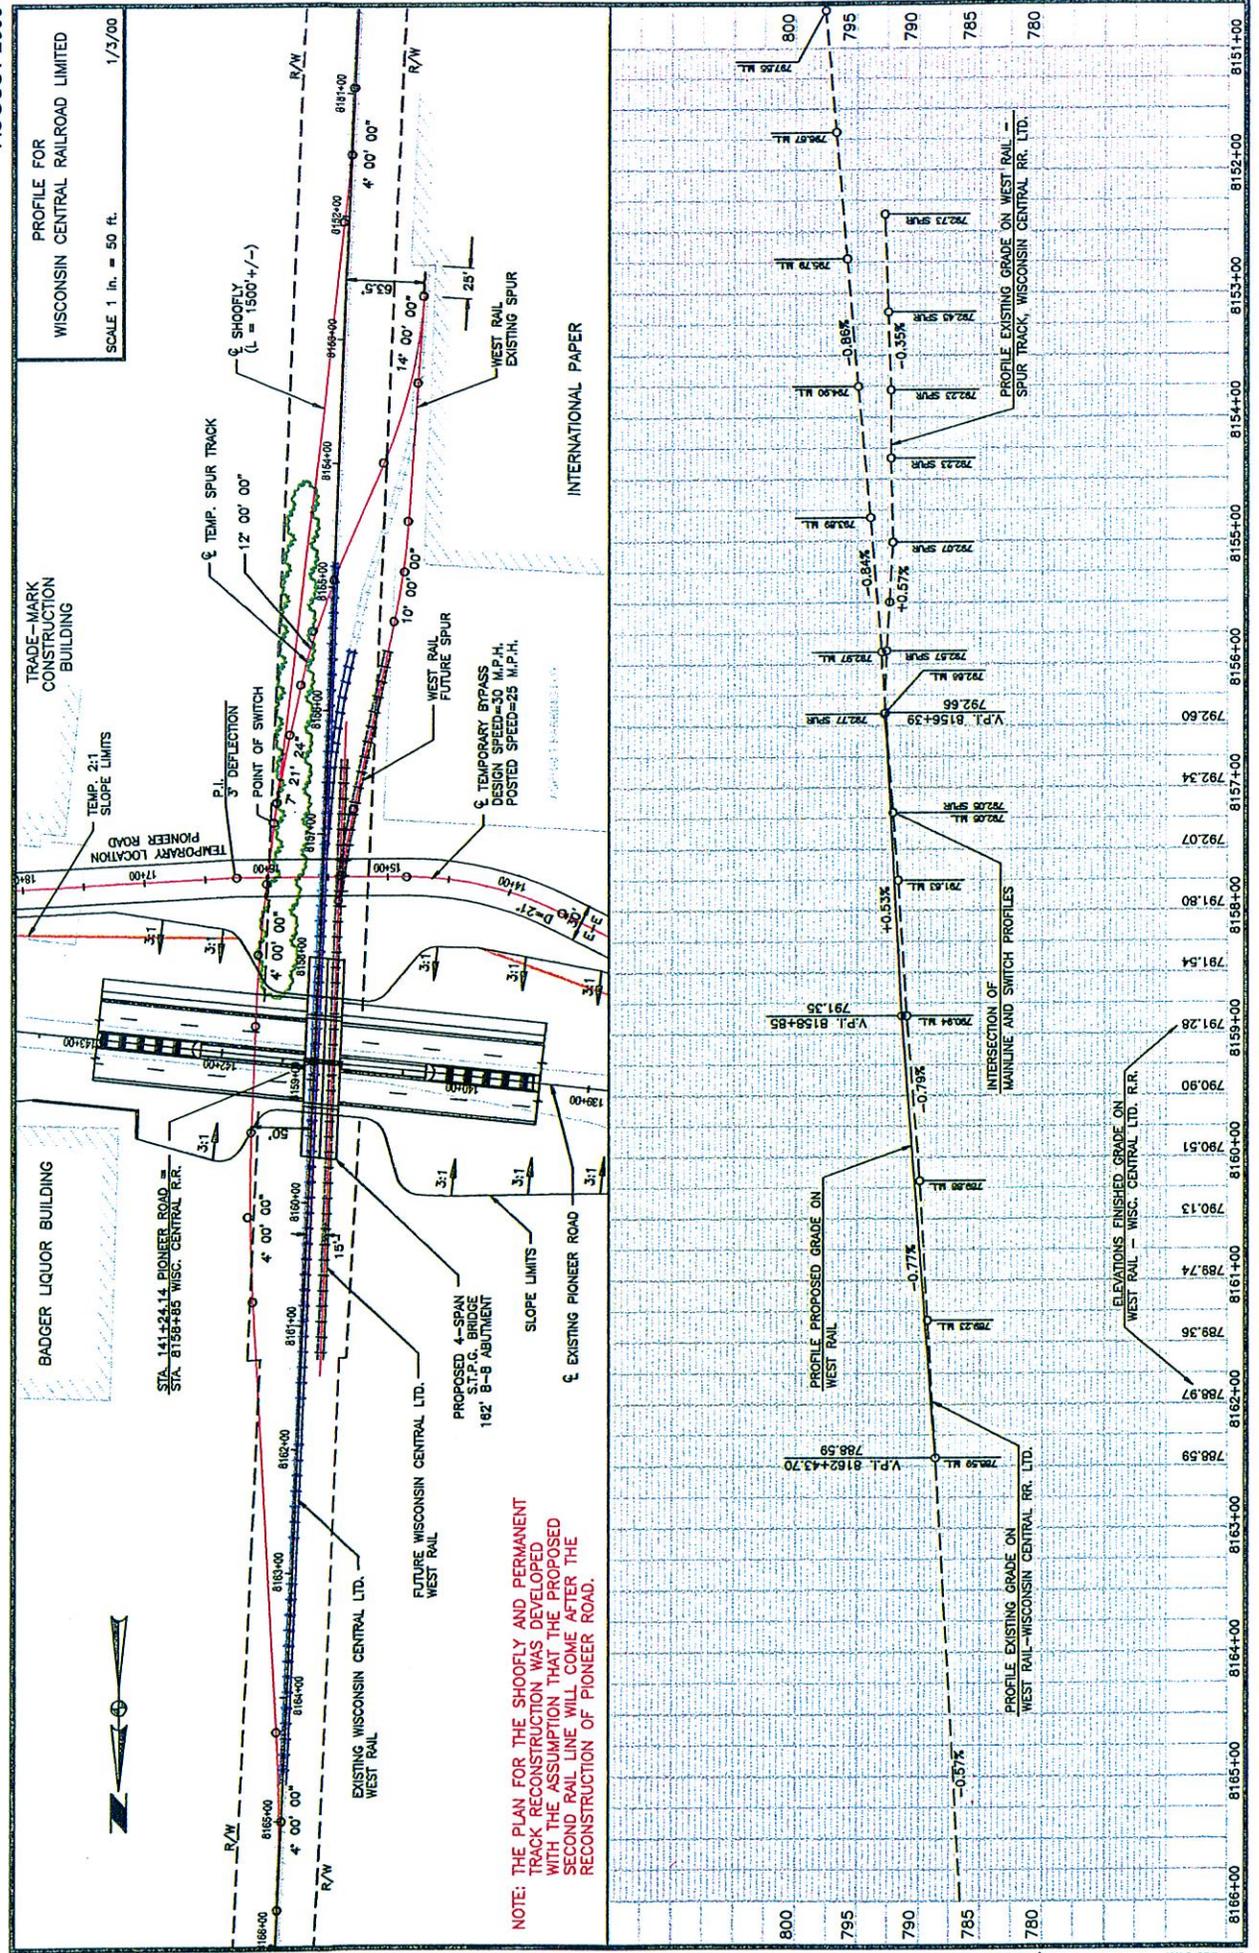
TEMPORARY BYPASS ROADWAY FOR PIONEER ROAD
